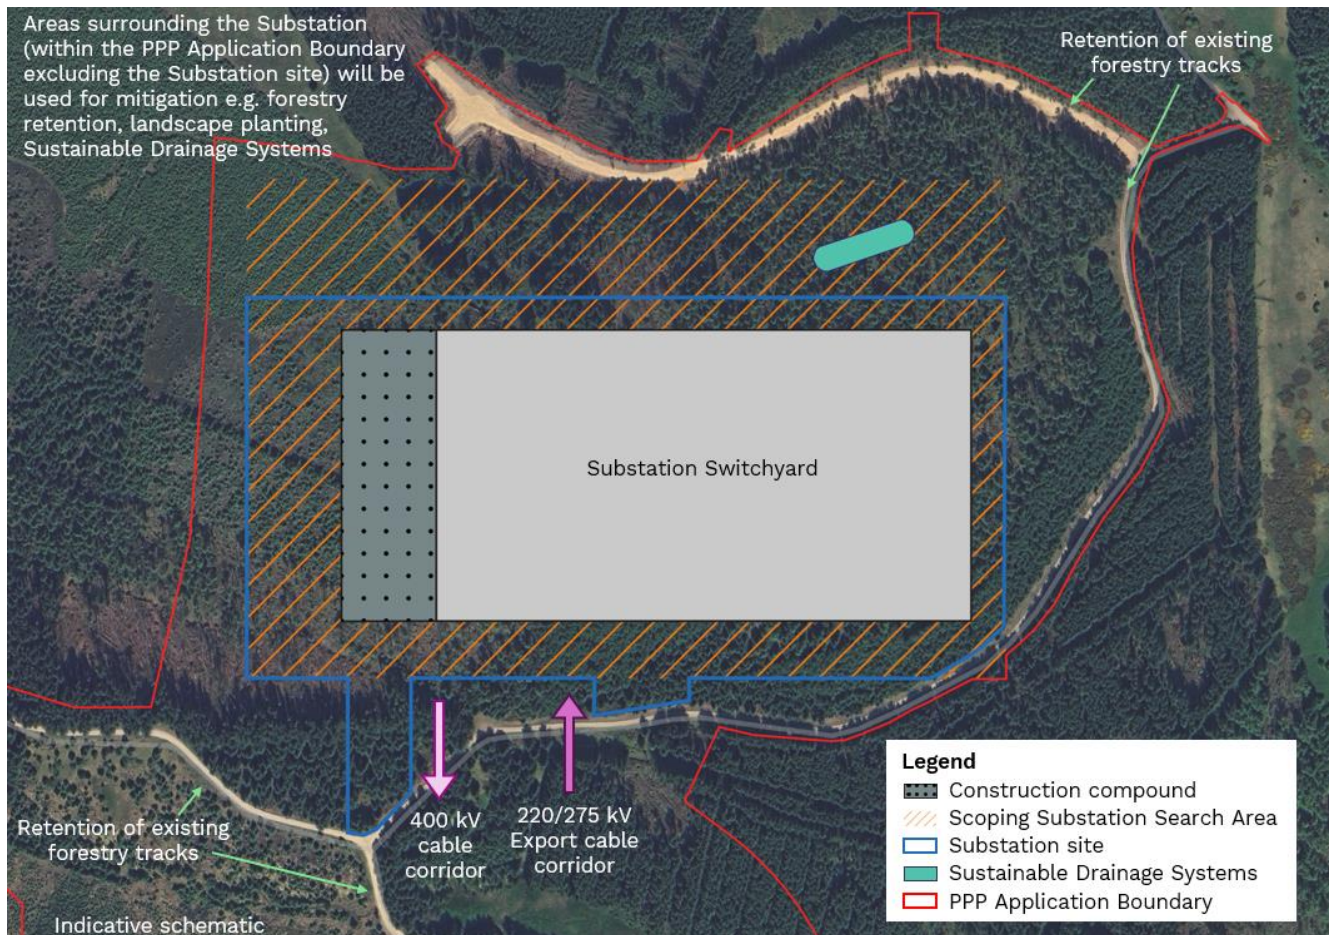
Indicative Substation Switchyard, Landscaping, Forestry Retention and Drainage Areas
